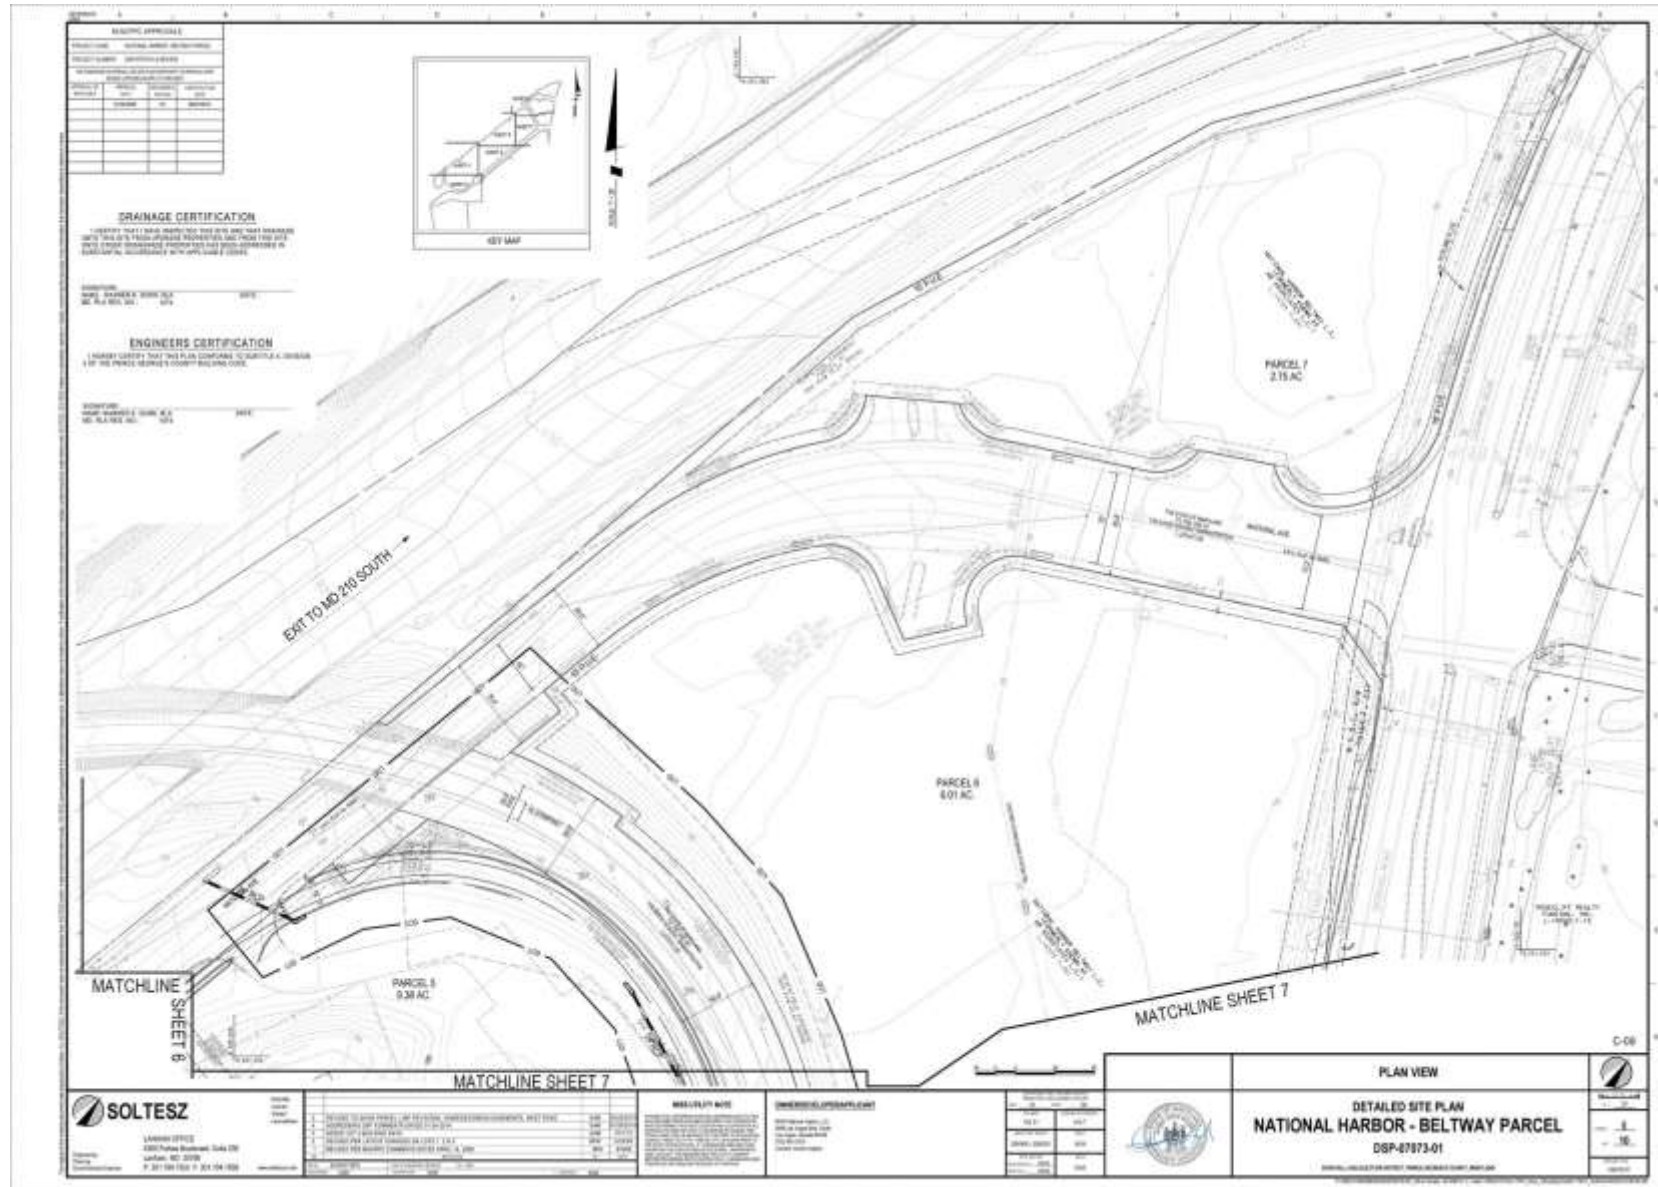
DETAILED SITE PLAN SET (PAGE 8 OF 10)
